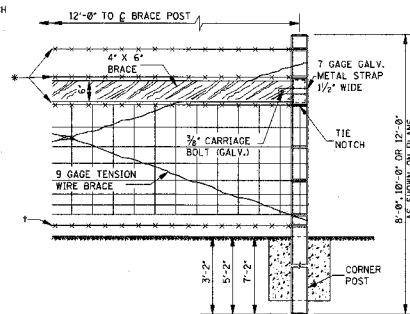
DETAIL OF TENSION WIRE NOTCH (BRACE POSTS AND CORNER POSTS ONLY)
